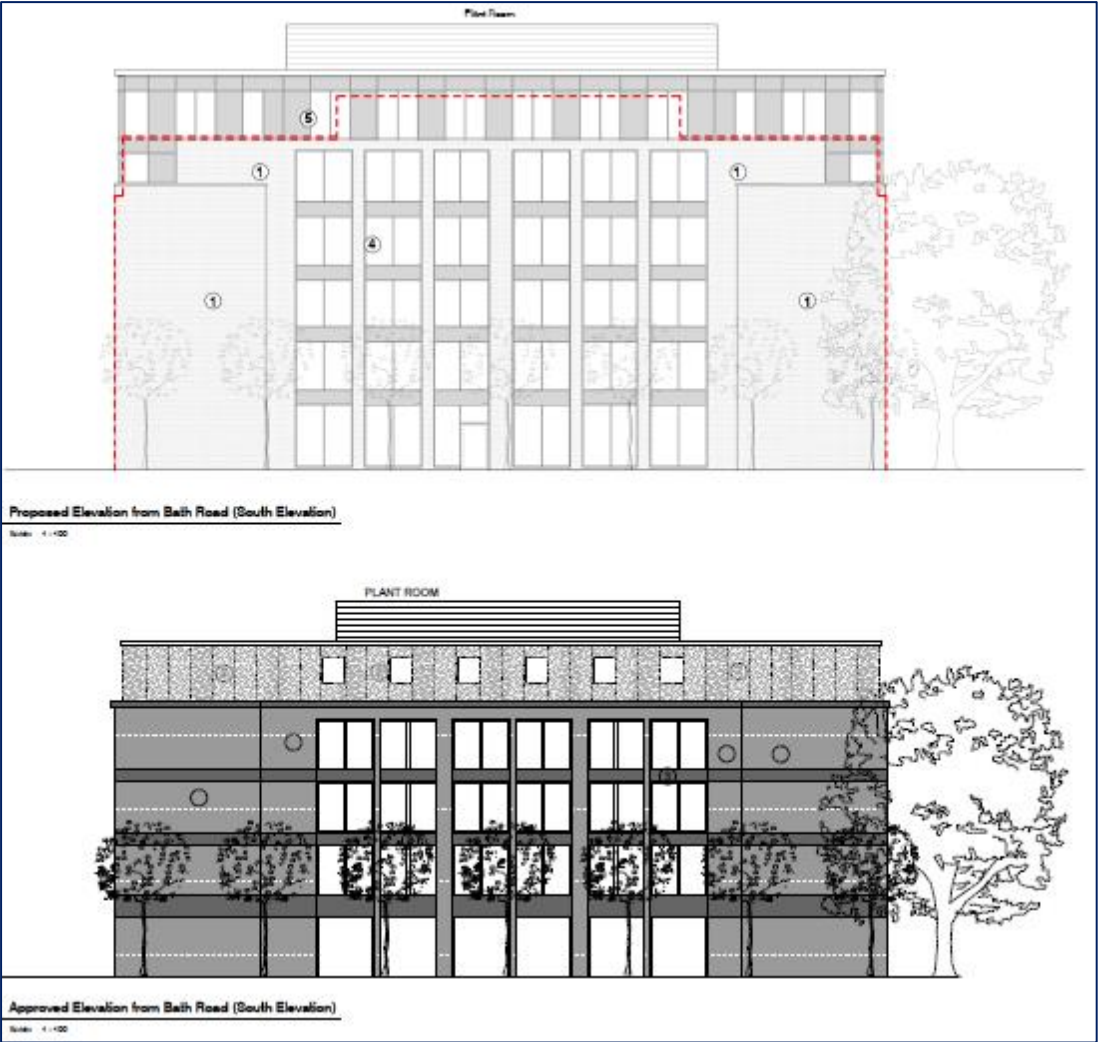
Proposed and approved elevation from Bath Road (South Elevation) [Ref. 1.0b]
